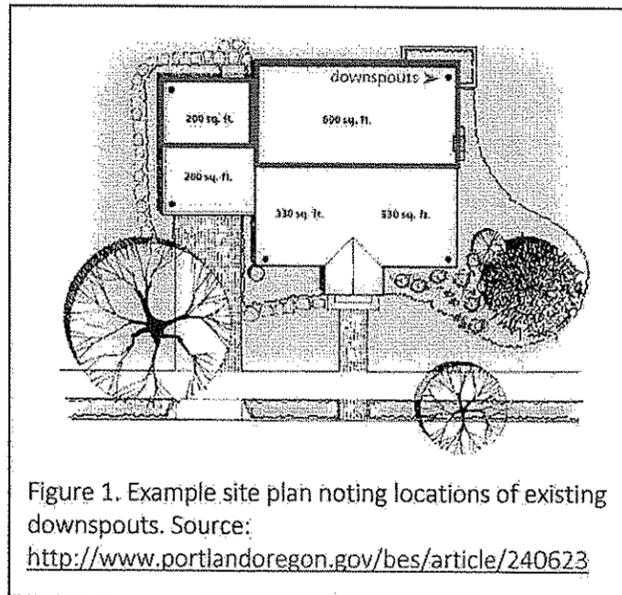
Example site plan noting locations of existing downspouts. Source: <http://www.portlandoregon.gov/bes/article/240623>
